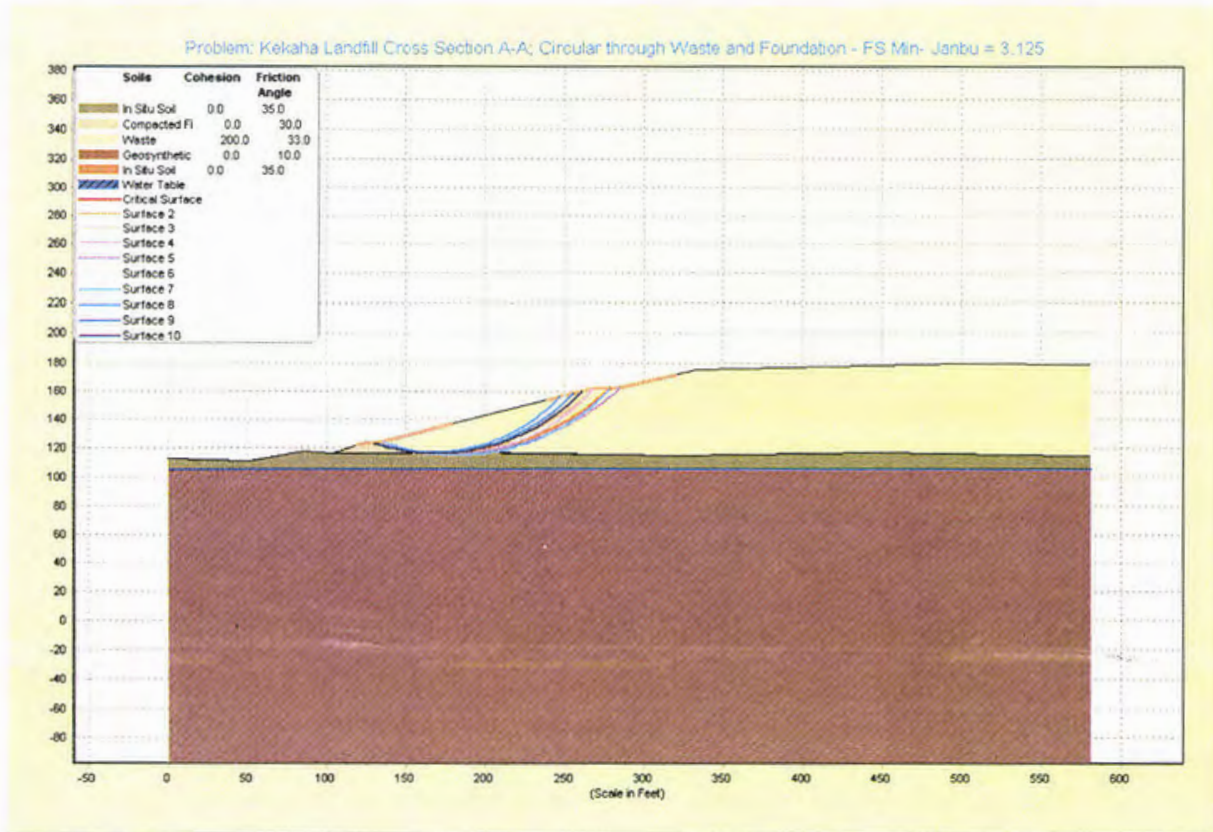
Section AA, Circular Failure, Waste Mass and Foundation Soils, Through Cell 1
